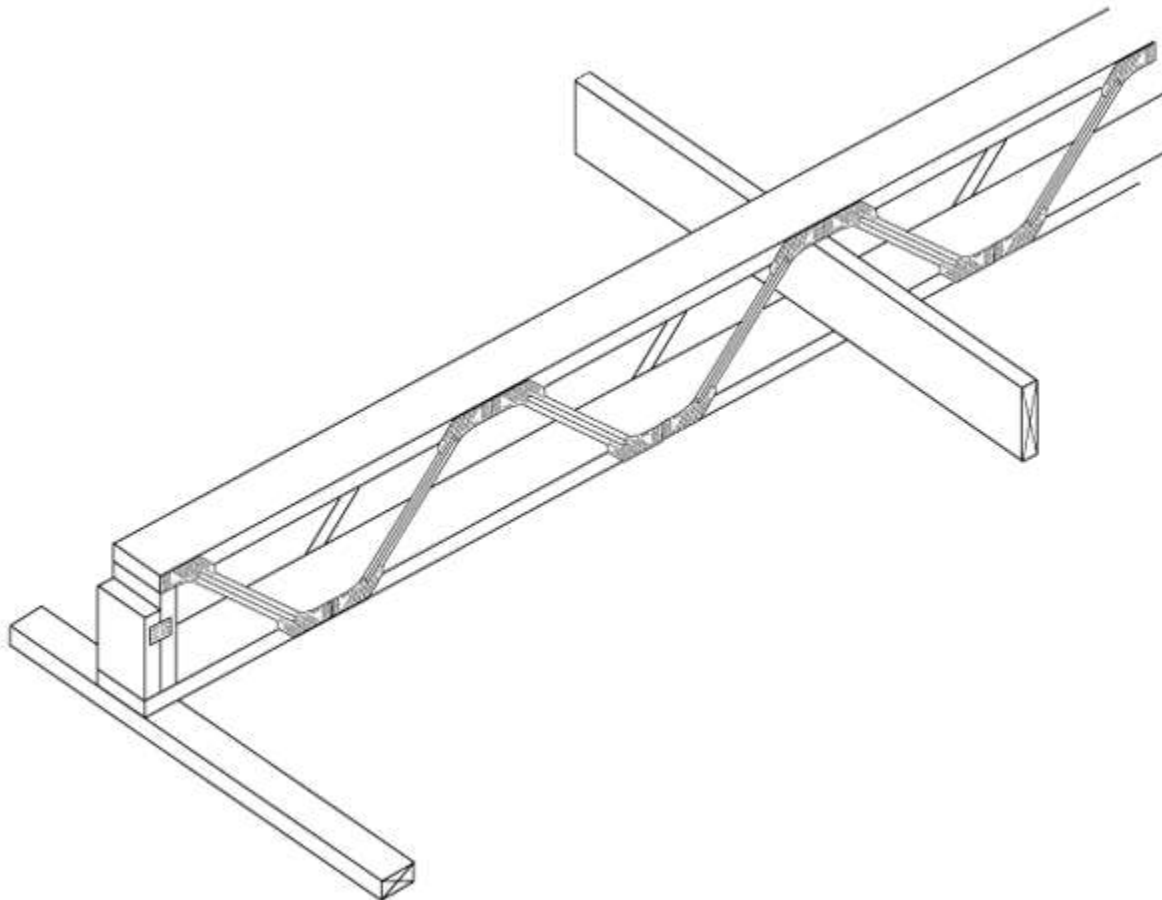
“Posi-Strut® Metal Web Joists” – floor application with strongback
